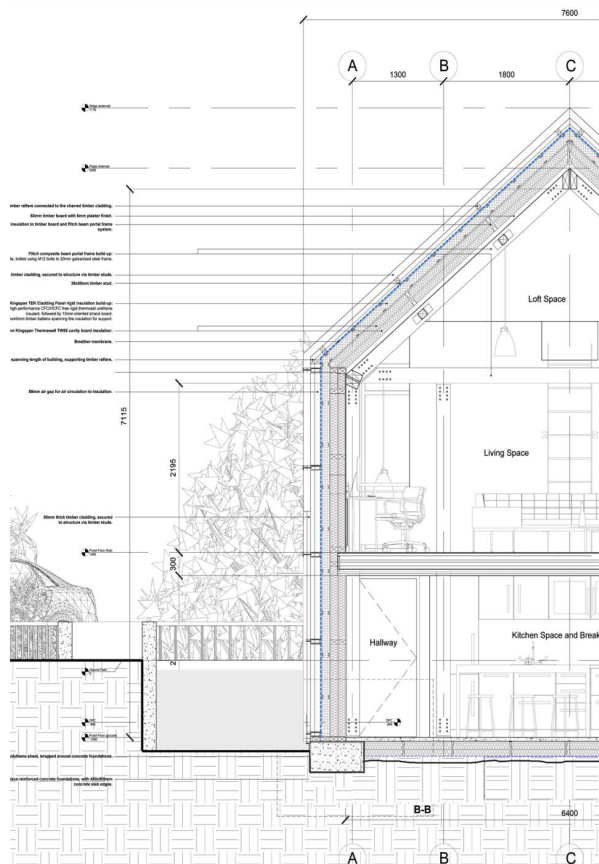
Example of section drawing for house type showing SIPS and CLT panel system
